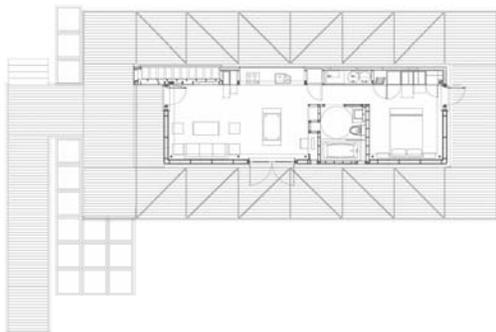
In the plan one can find efficient space planning, a very compact and multifunctional north "core" wall, a bathroom "core" separating public and private, west, south and east insulated translucent wall assemblies, the wrap-around deck with converted truss framing, and the landscape water filtration planters.
